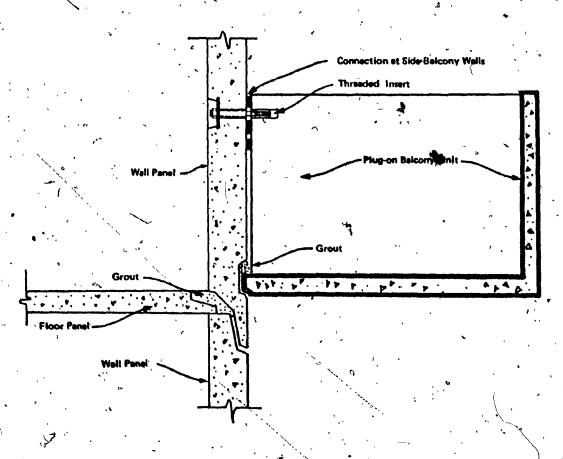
Section of Plug-On Balcony Unit (Ref. 32)
